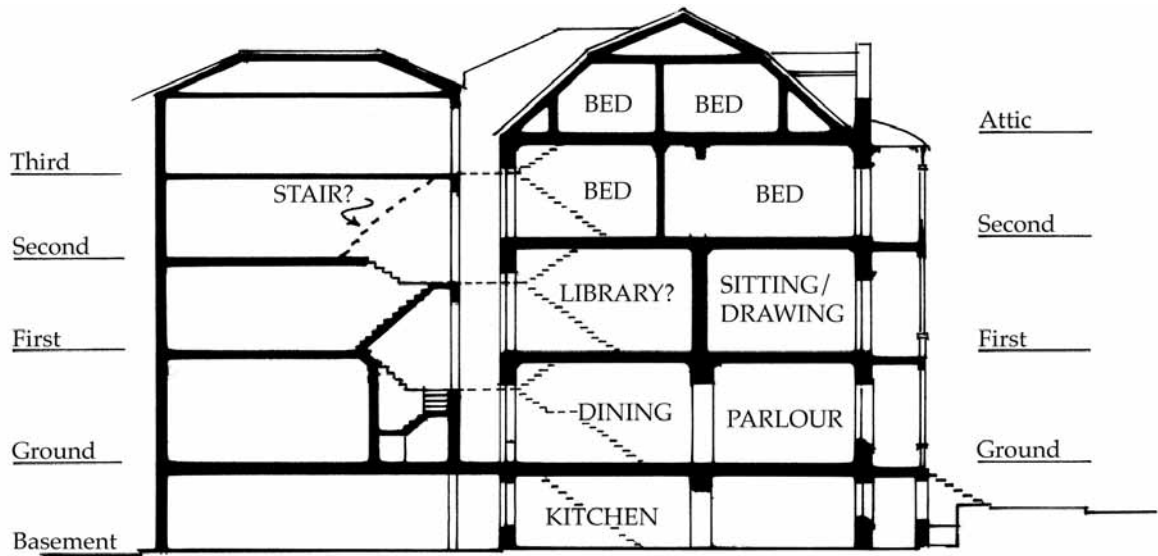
History House, 1872 (as originally built), cross section.
